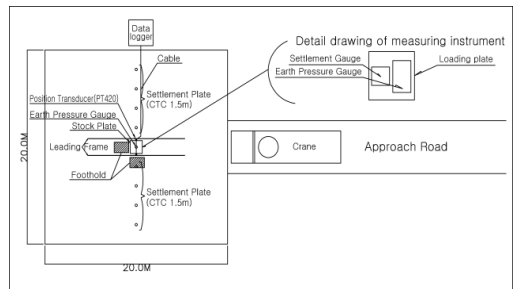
Detail drawing of the measuring instrument during the on-site large plate loading test
